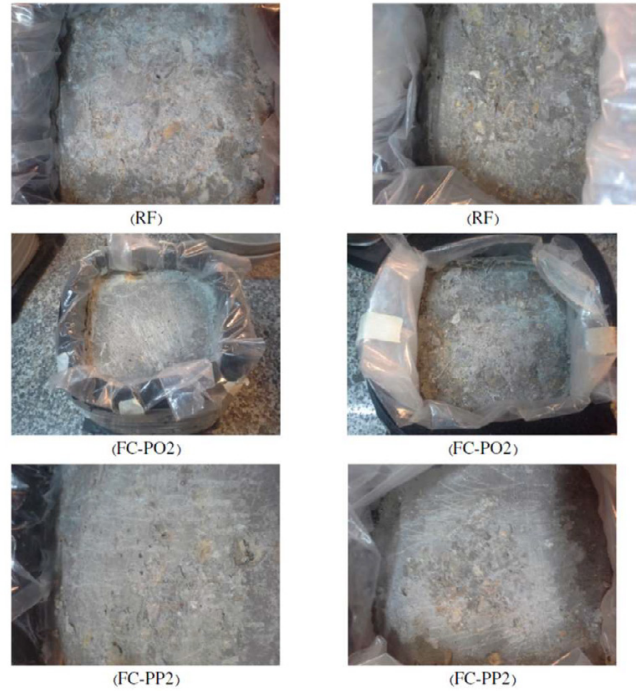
Visual inspection of specimens after salt-scaling test
